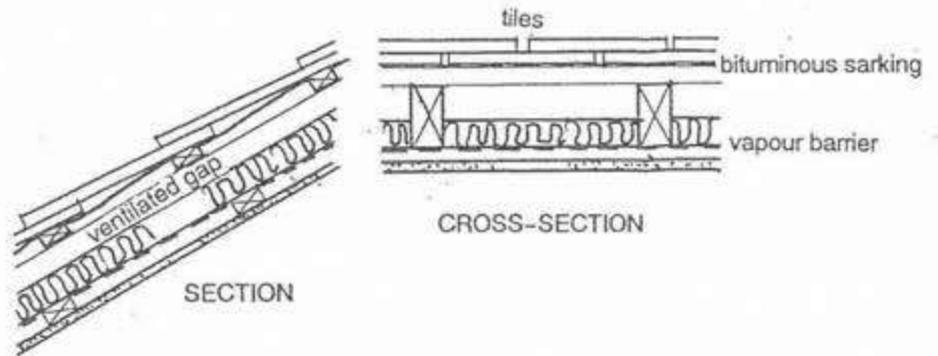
Insulation of a pitched roof with coupled ceiling
